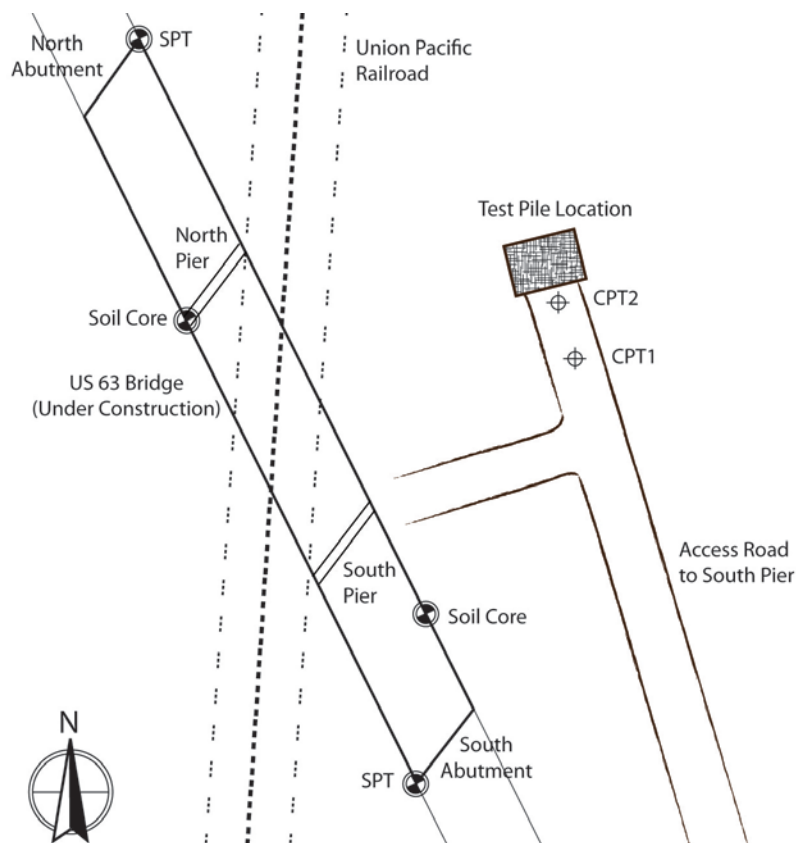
Plan view of the Oskaloosa bridge site including locations of test piles
